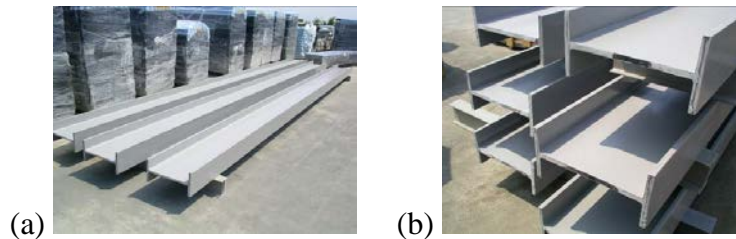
Appearance and cross section of the H-shaped GFRP girder: (a) pultruded H-shaped GFRP girder and (b) the cross section of the GFRP girder.
